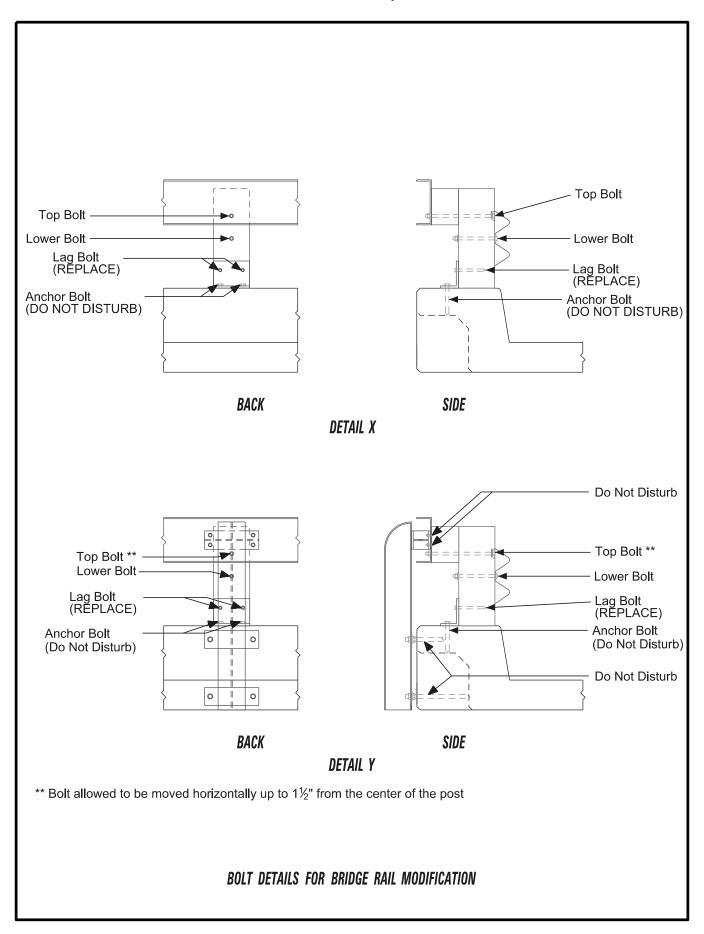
Typical bolting arrangement – looking at the backside of wood blocks and steel channel
